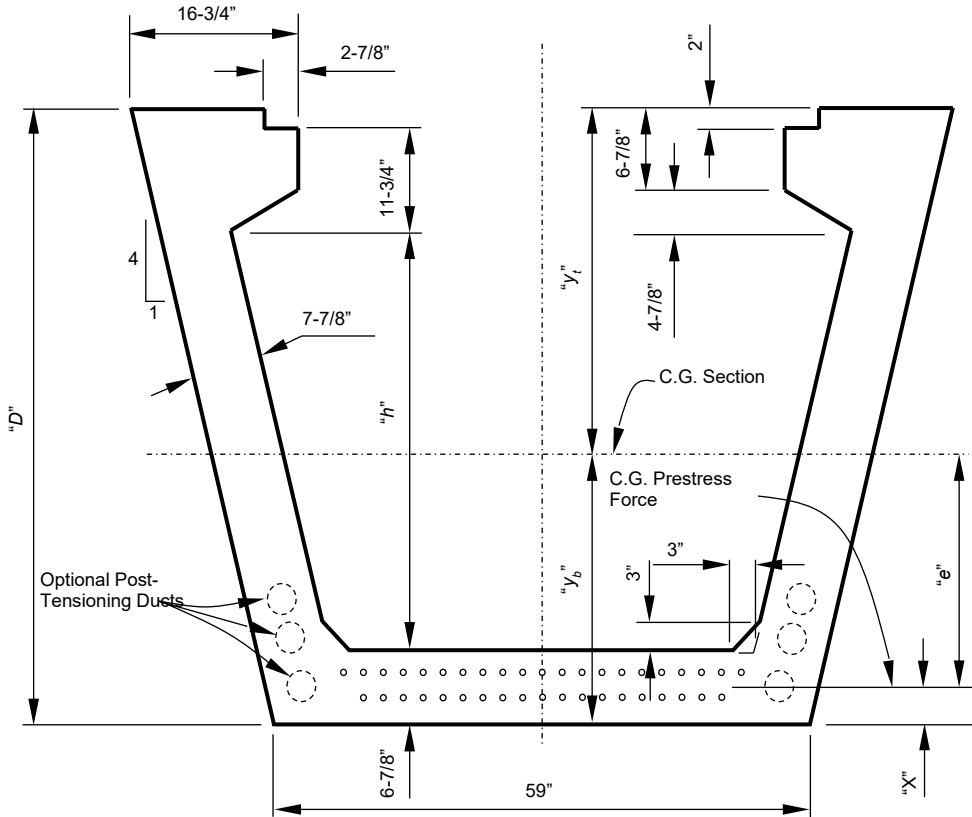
California Standard “Bath-Tub” Girder Typical Section
